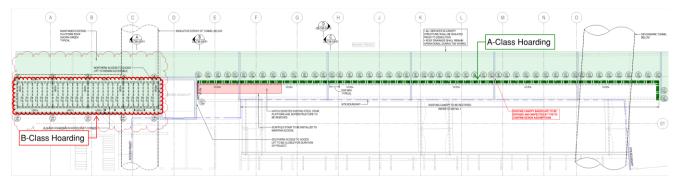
Hoarding Plan – Platform 1 Central Station
